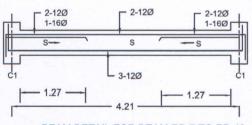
# DETAILED DRAWING OF REINFORCEMENT OF BEAMS AT ROOF LEVEL
